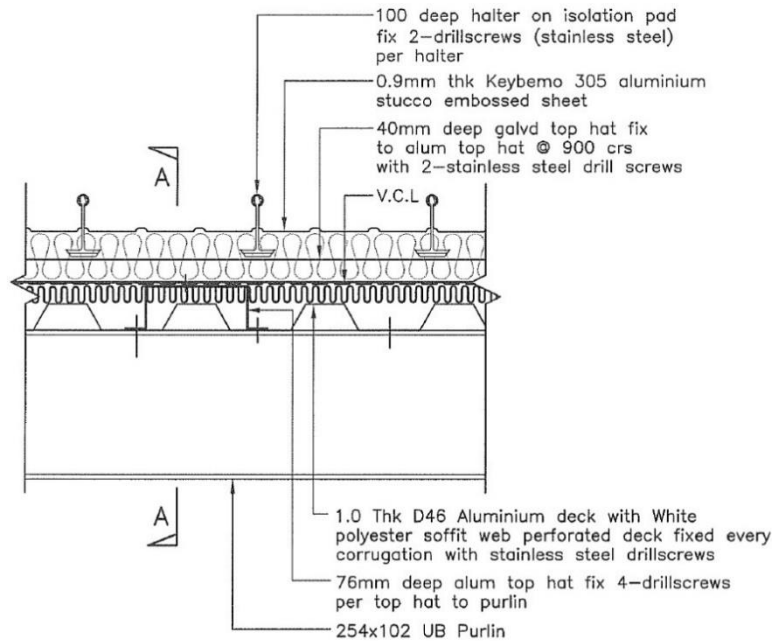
b. Typical as-built section through the roof (Confidential Source, 2015).
